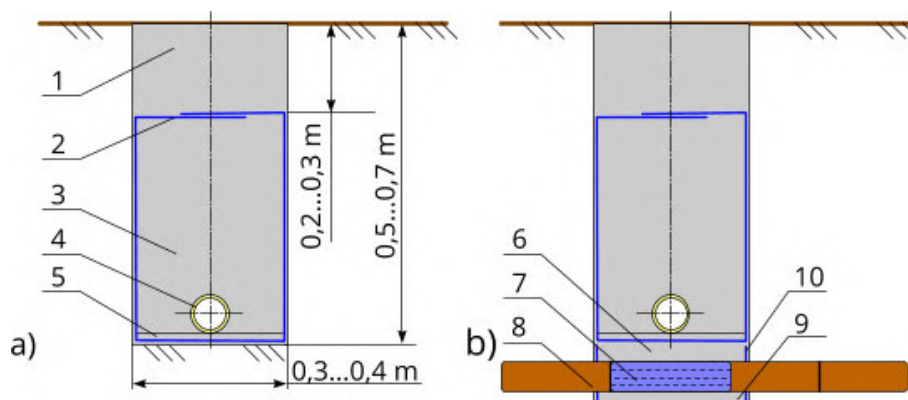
Scheme of laying drainage: a - with sprinkling of crushed stone and geotextiles; b - with the organization of the inclusion of pottery drainage; 1, 3, 5, 6, 9 - crushed stone sprinkling; 2, 10 - geotextile; 4 - corrugated polyethylene perforated drain; 7 - repair perforated pipe; 8 - pottery drainage.
